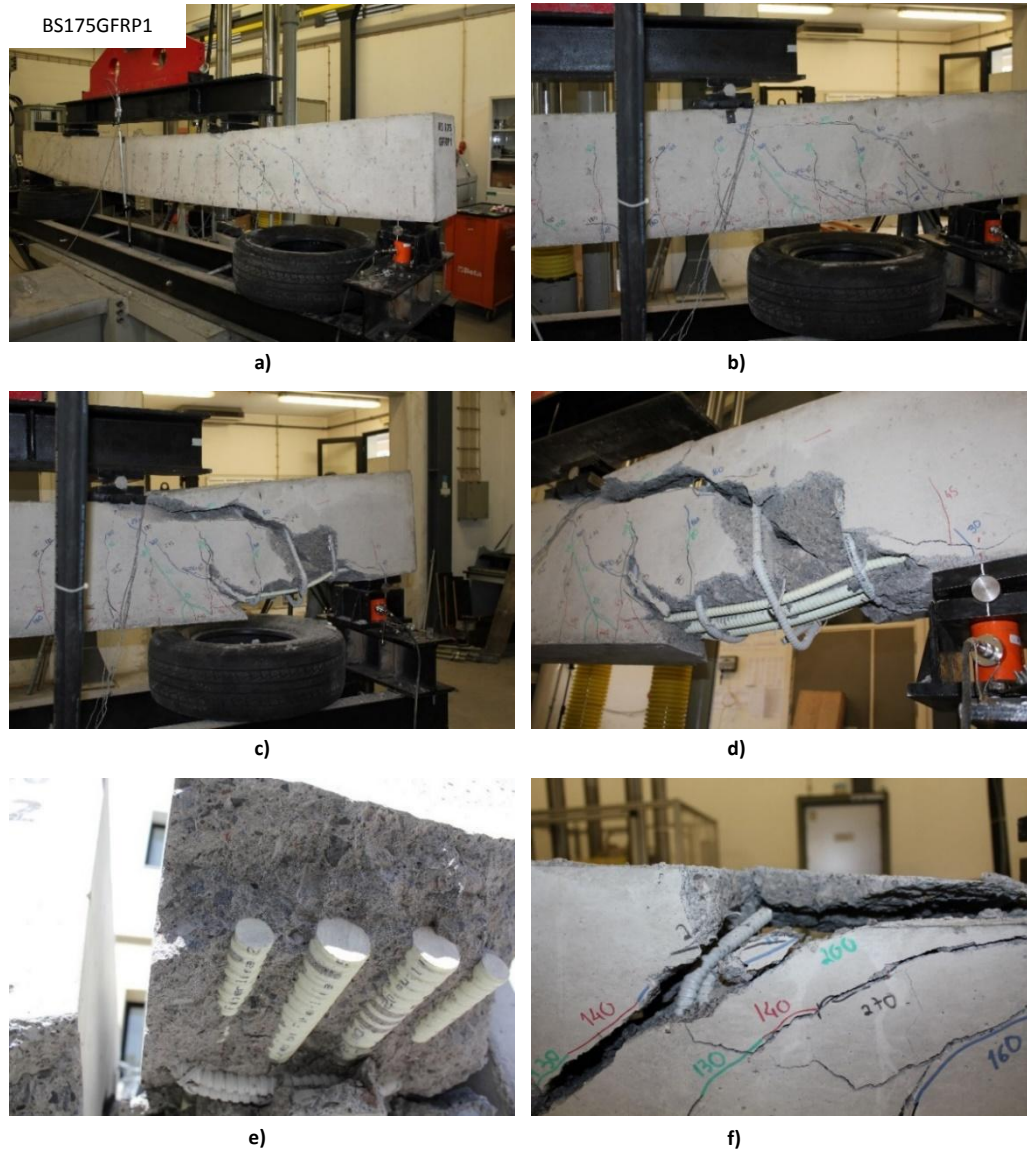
BS175GFRP1 beam failure: a) overall view before failure; b) shear span before failure; c) shear-span after failure; d) concrete crushing; e) no-slip of longitudinal reinforcement; f) disintegrated stirrup at loading-point
